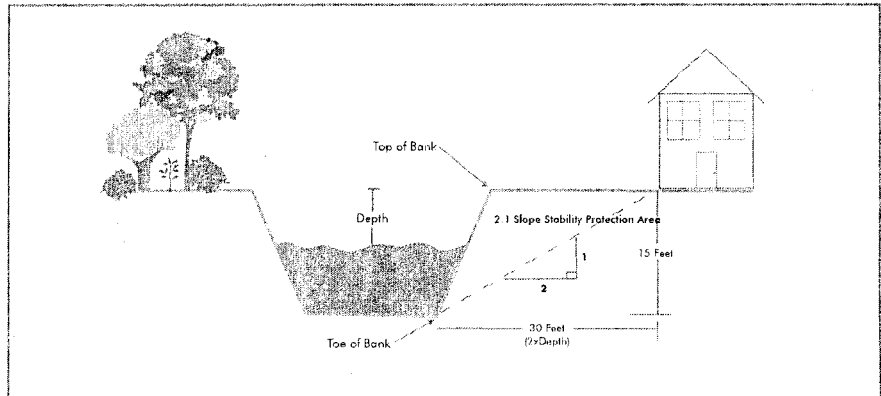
Protection or trigger area for a trapezoidal shaped channel.
